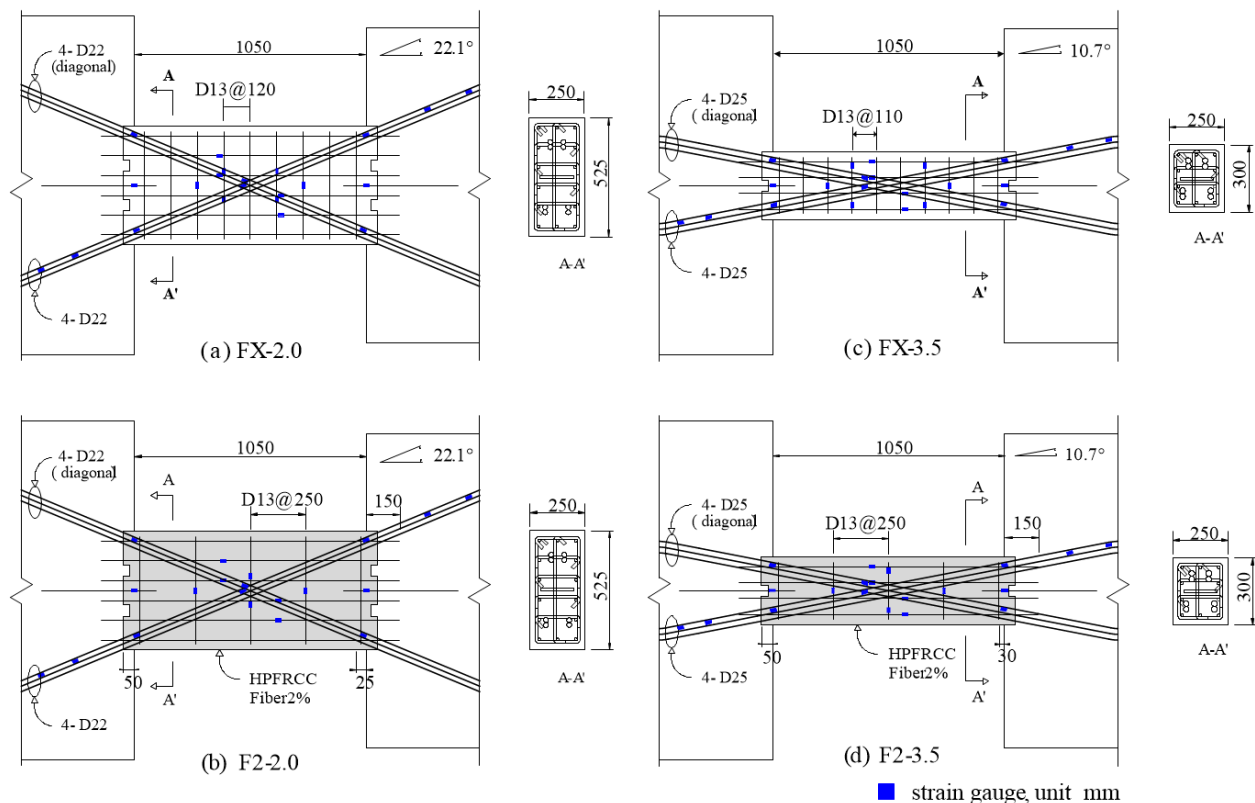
Dimensions and reinforcing details of coupling beam specimens.
